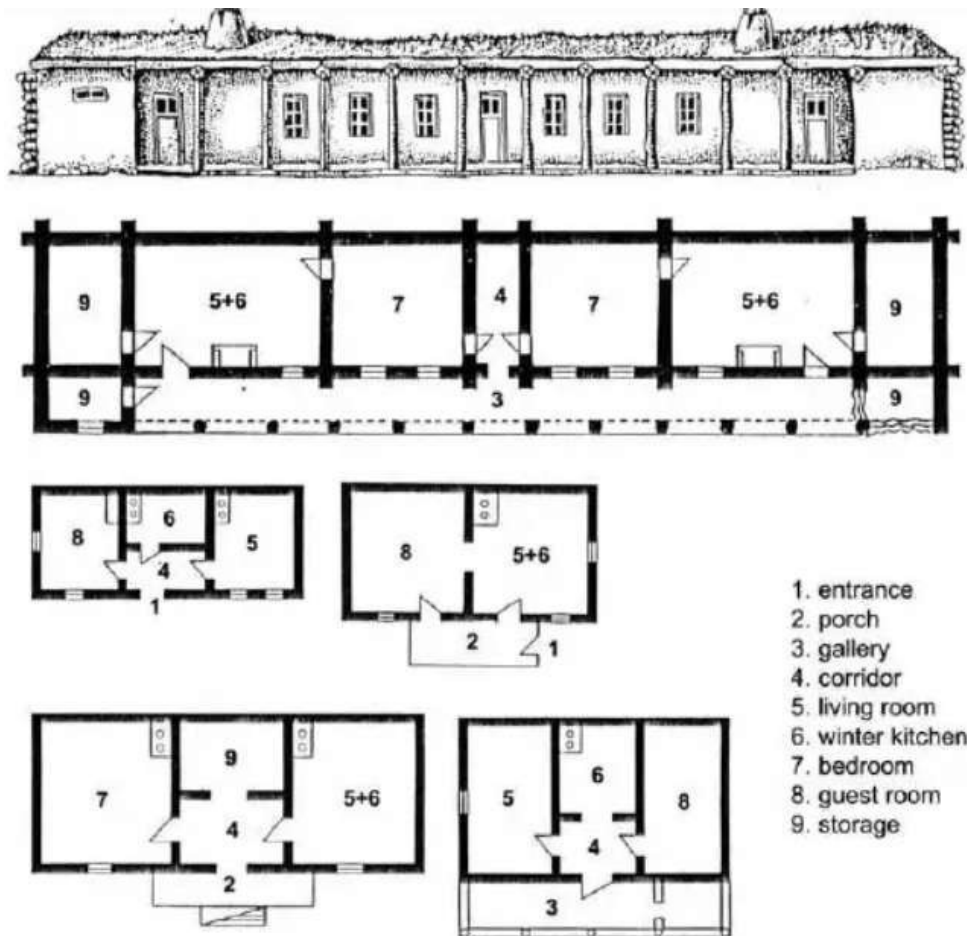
Plan of Archetypal Circassian Gallery House, Shawash (2003). Note the large porch areas and wood beams.
